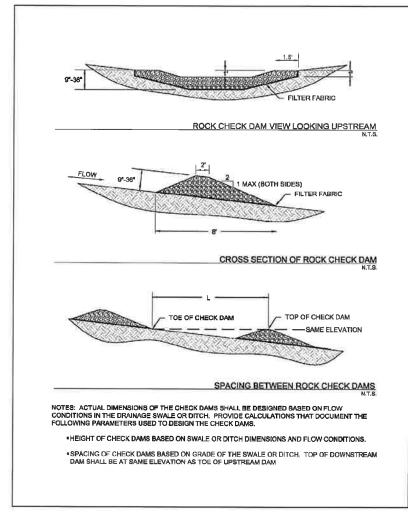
Schematics of Rock Check Dams (Source: Modified from Stormwater Management Manual for Western Washington)
